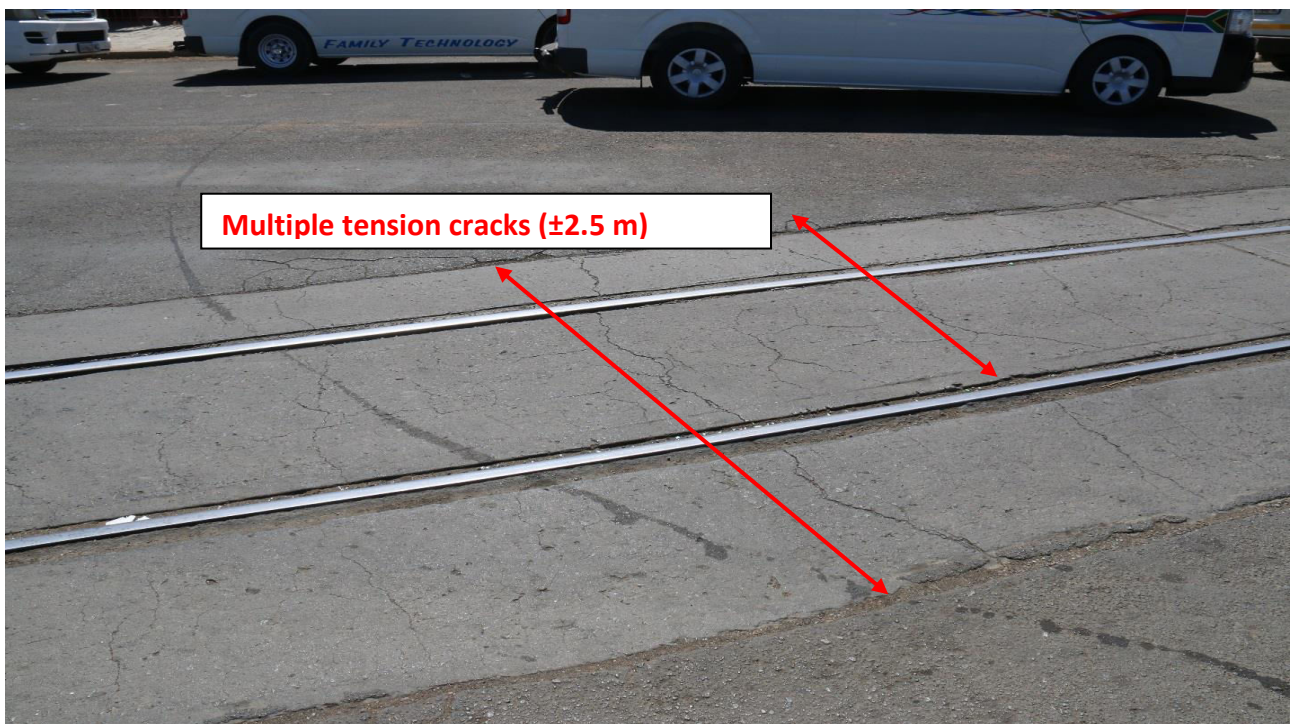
Multiple small-scale tension cracks on Bultfontein Road.
